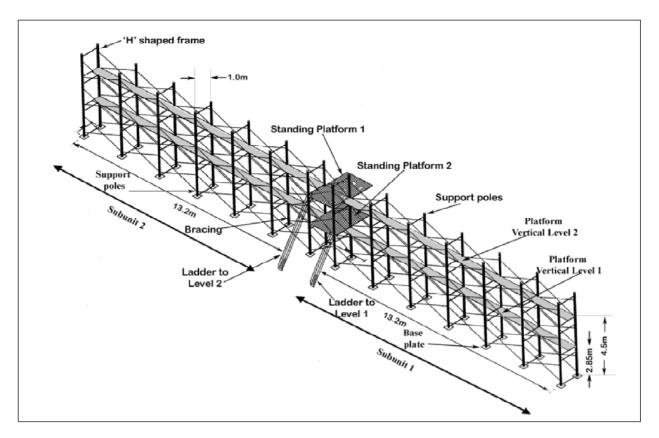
Isometric view of the Elevated Hybridization Platform structure
